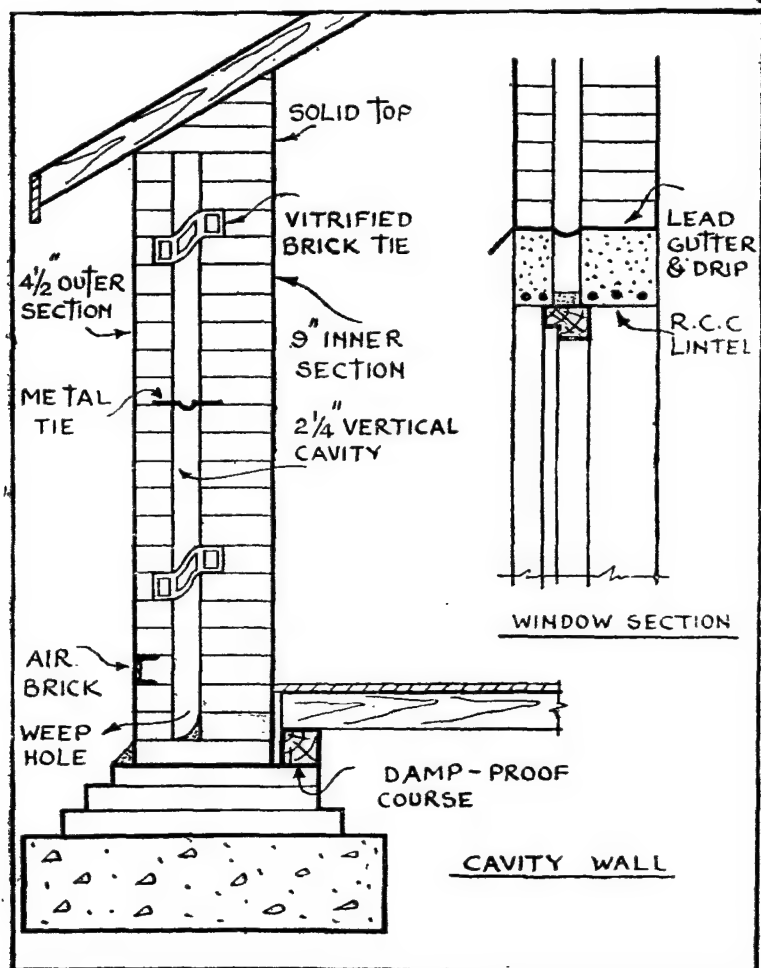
, Cavity wall construction. Fig 157. Cavity wall at the openings.
